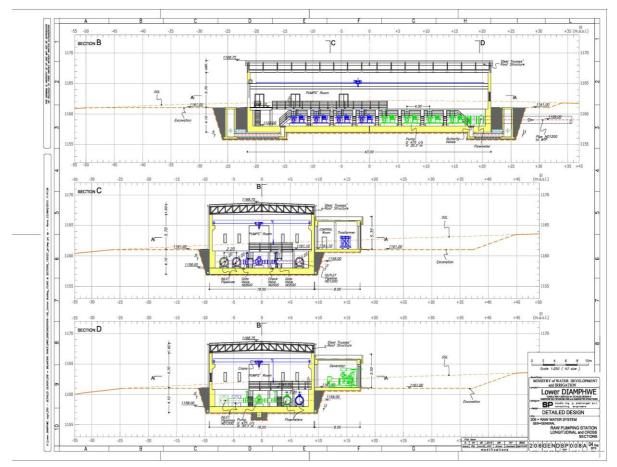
Raw Water Pump Station Elevation (Ref. SP 2015)
